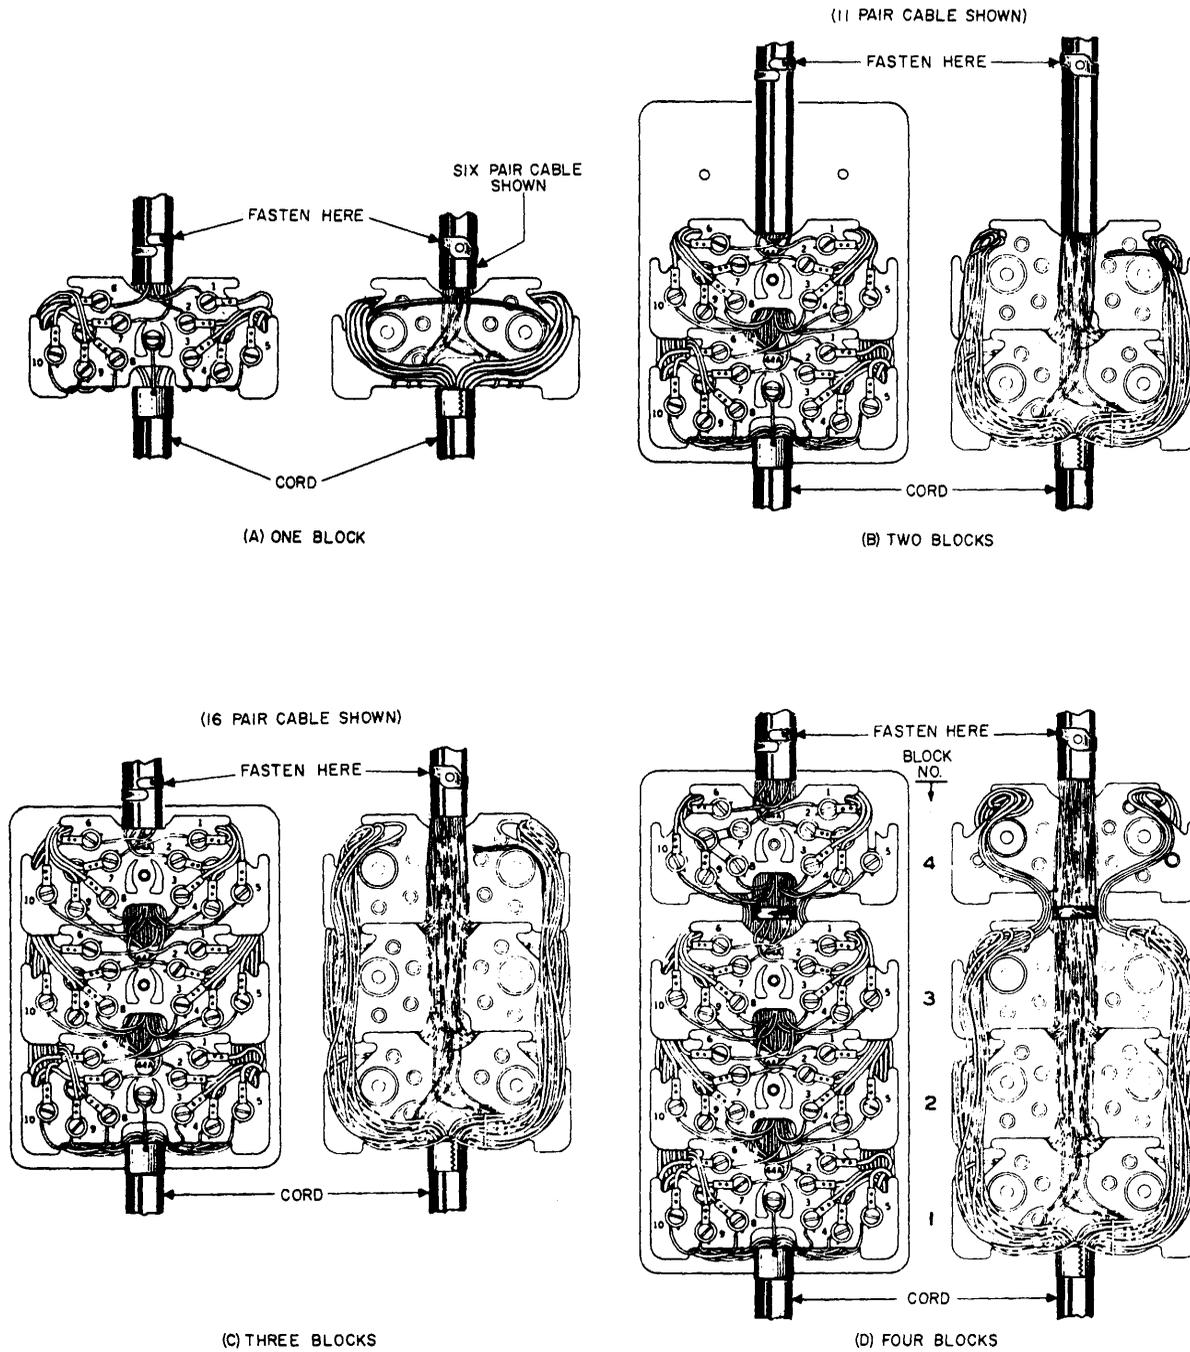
Terminating Inside Wiring Cable on Number 44A Connecting Blocks.
